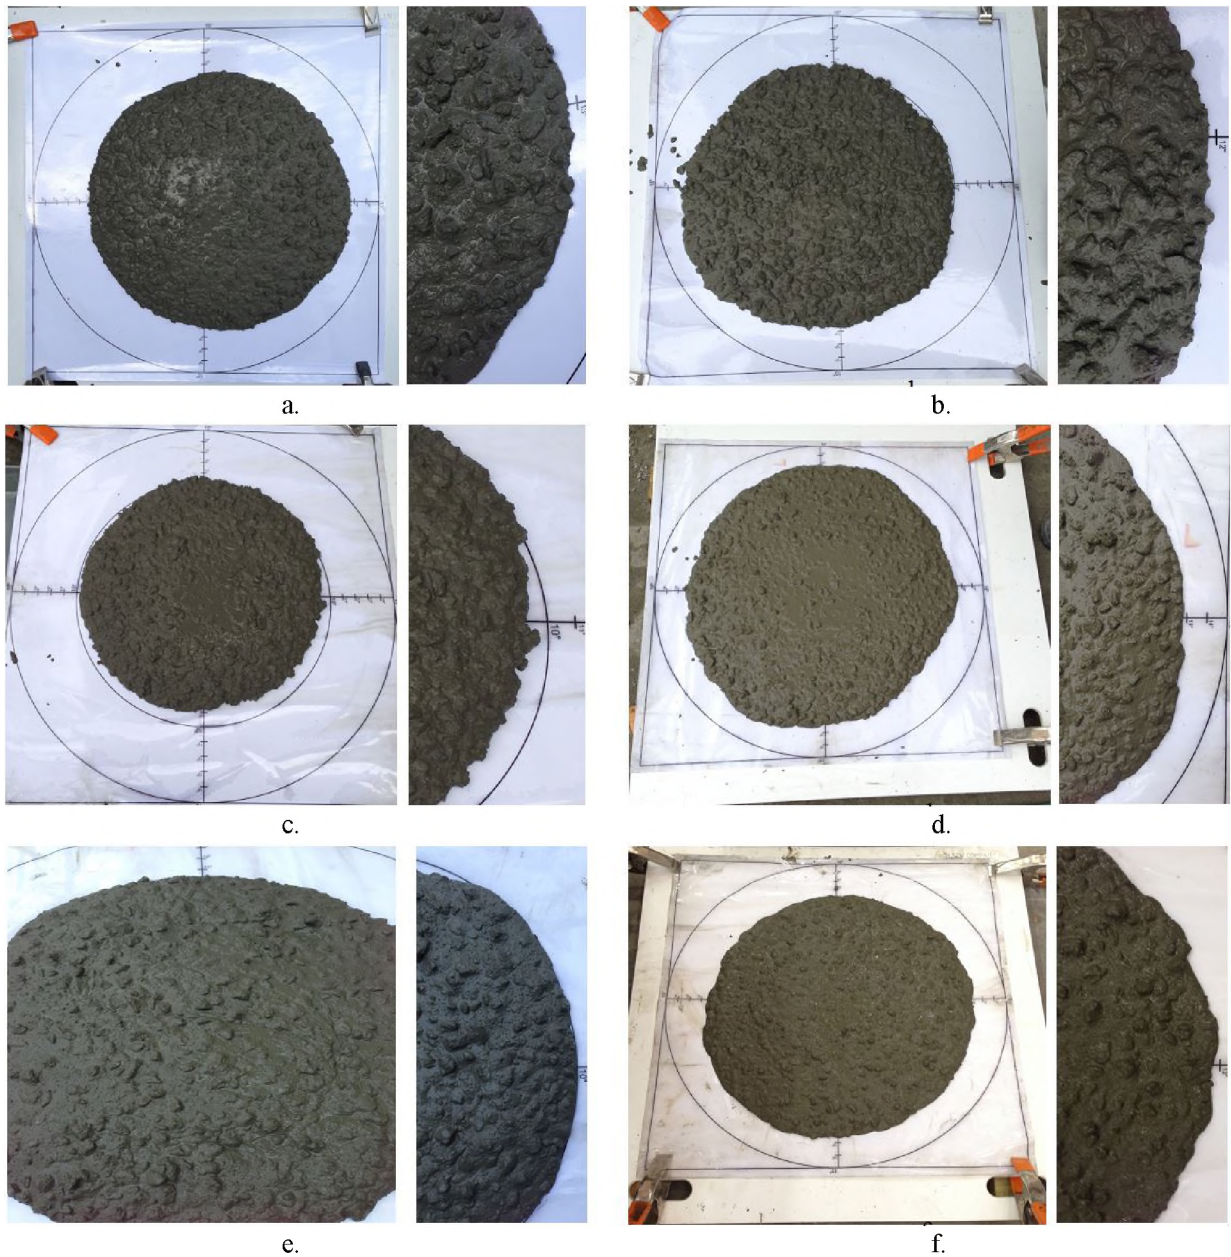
Samples after “S” groove test and VSI, part A. (a. 0528-1, b. 0530-2 c.0605-3, d. 0610-1, e. 0623-1, f. 0624-1).
